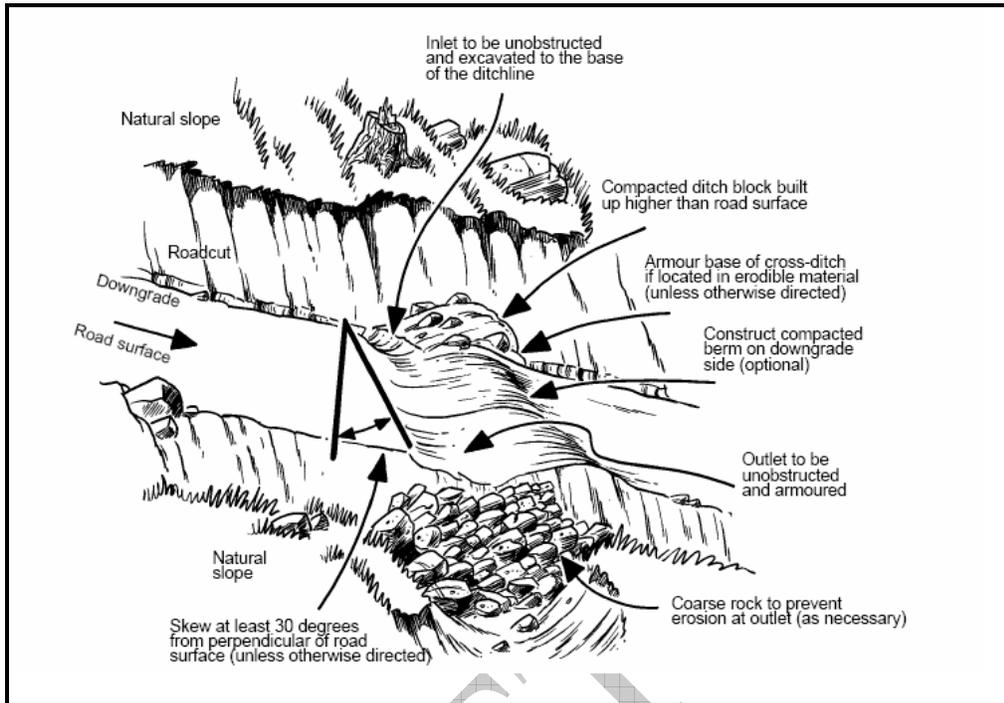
Cross ditches can help get the water across the road before it builds up too much momentum. .
